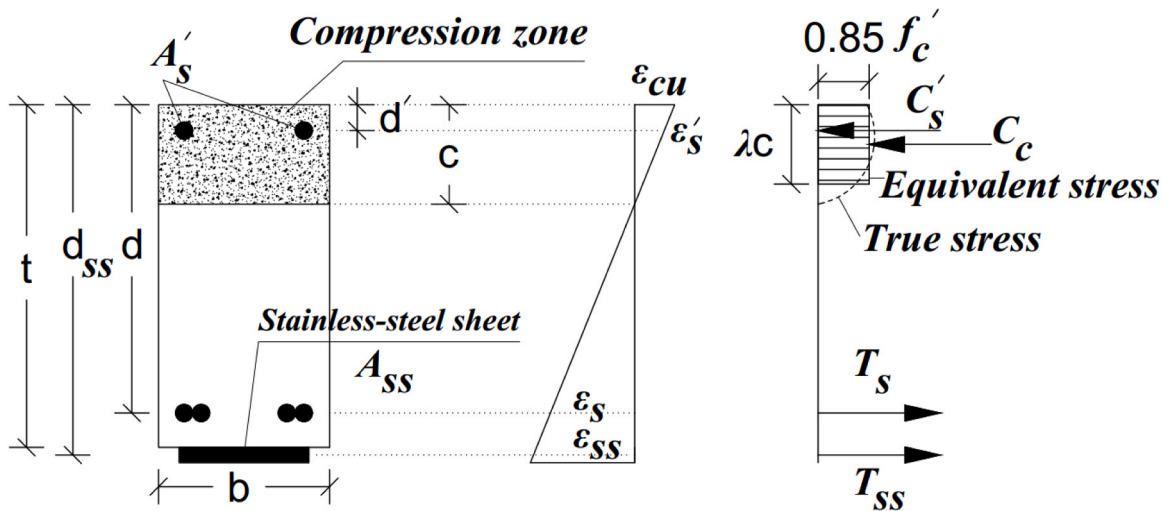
Cross-section of a beam strengthened by external SSSs.
